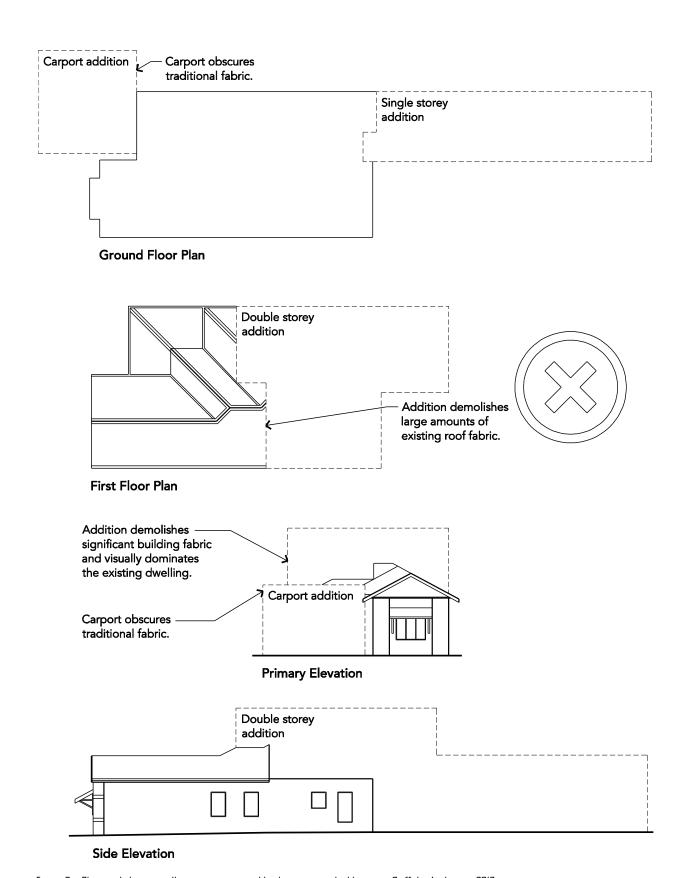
Plans and elevations illustrating incompatible alterations and additions – Griffiths Architects 2012.
